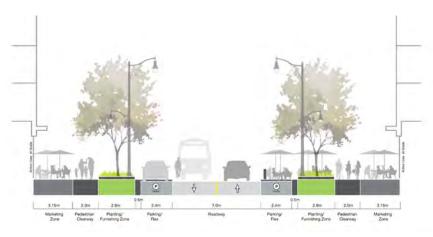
2-Lane with Shared Use Lanes and Parallel Parking
